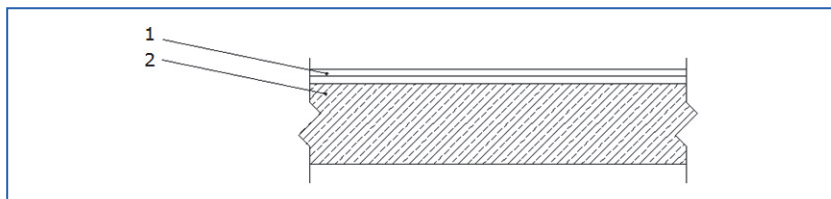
Floor. 1) Wooden floor; 2) 200 mm monolithic concrete slab.
